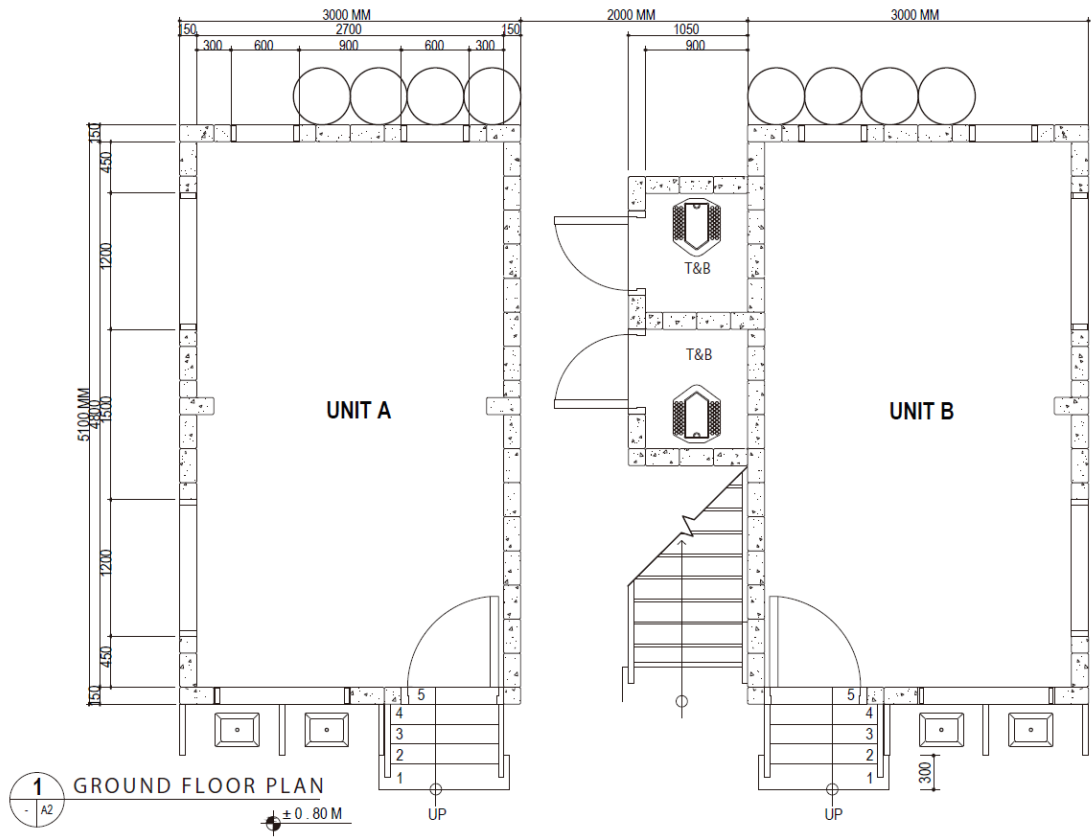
50: Ground floor plan of house (Source: University of San Carlos)
